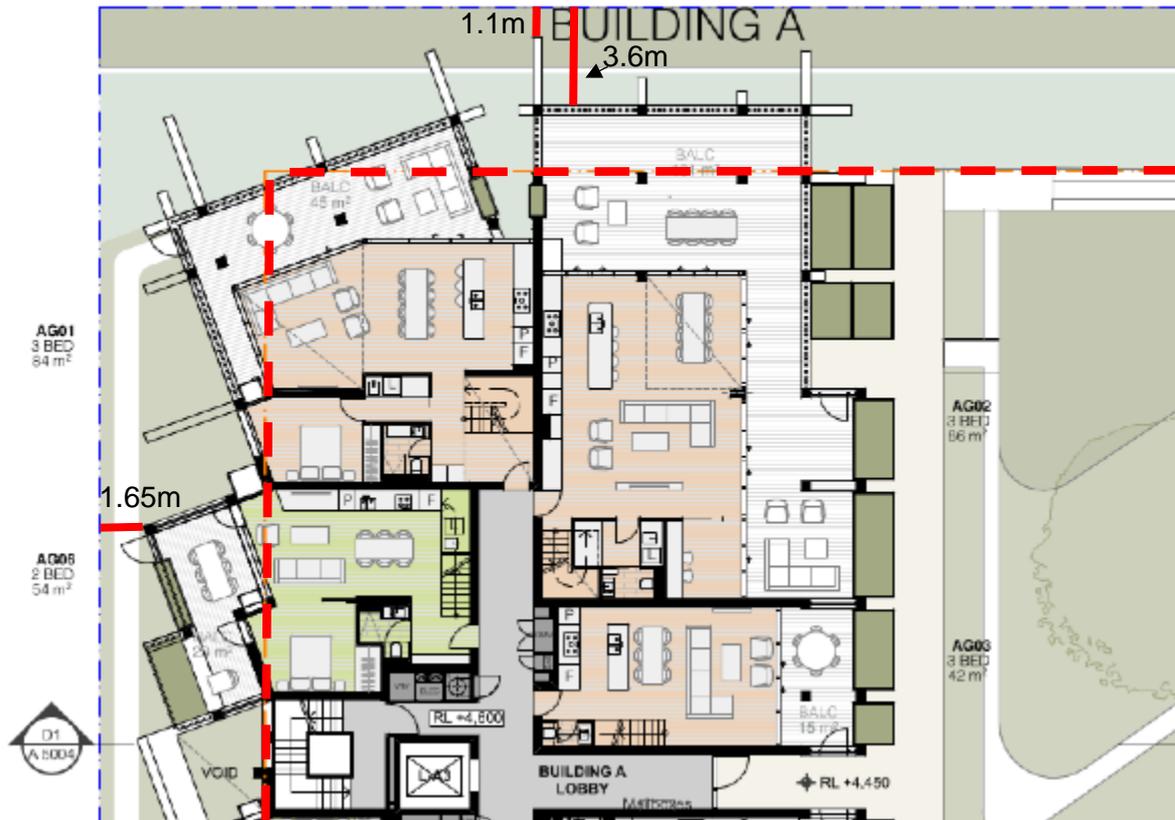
Proposed ground floor south west corner of the site adjoining Sydney Park, reduced to a minimum of 1.1m.
